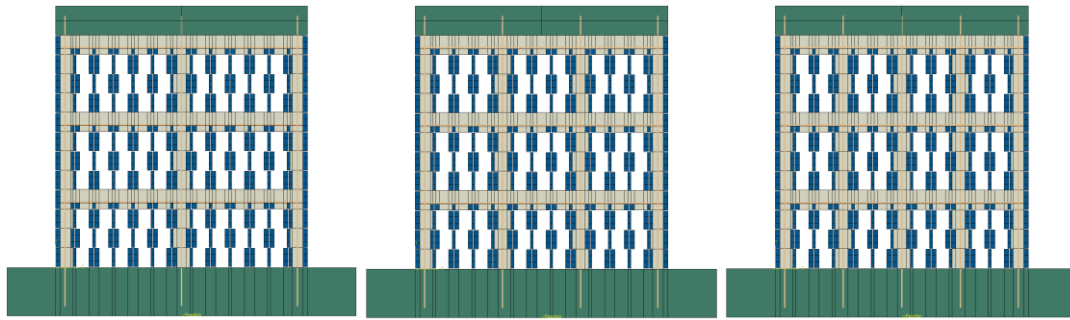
Grout Core Spacings (2.4 m Wall Height, 0.6 m Bond Beam Spacing)
